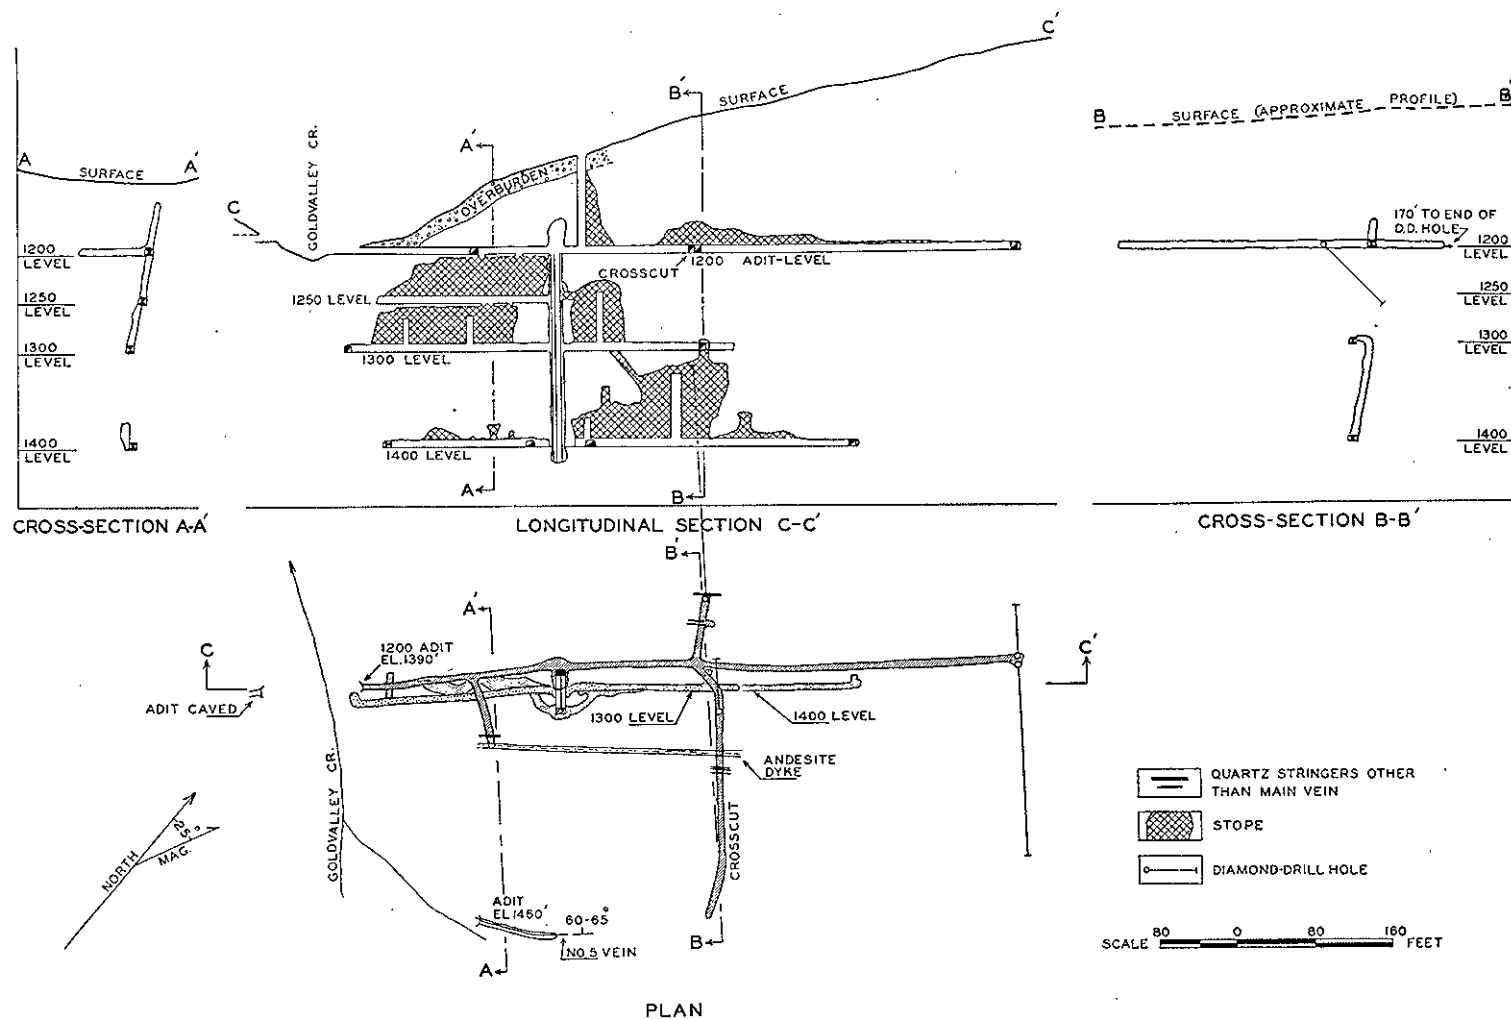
C.D. (Rey Oro): Composite plan of levels, longitudinal section, and two cross-sections on main vein, formerly known as No. 4 vein.
